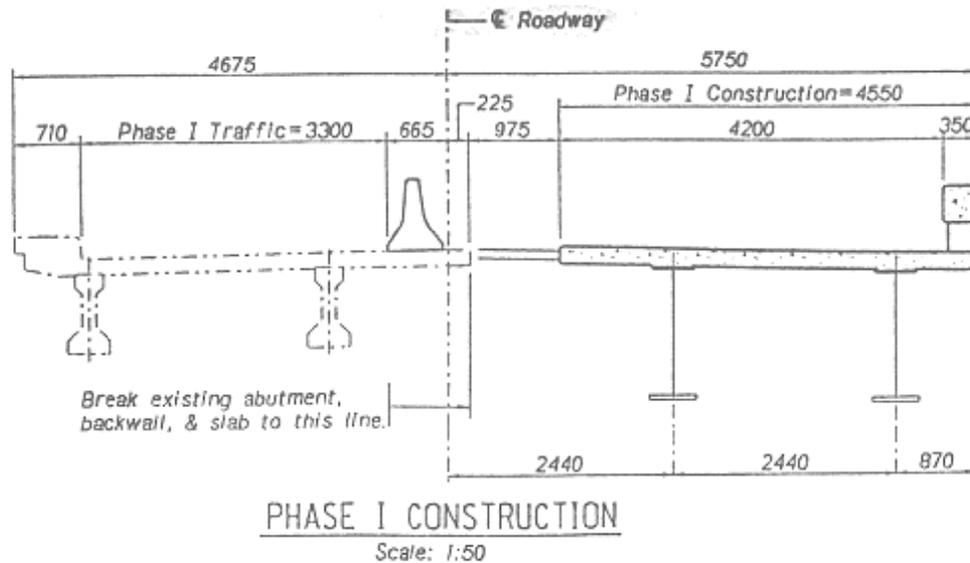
South Snyder River Bridge, Phase I Construction with a Two-Girder System.
